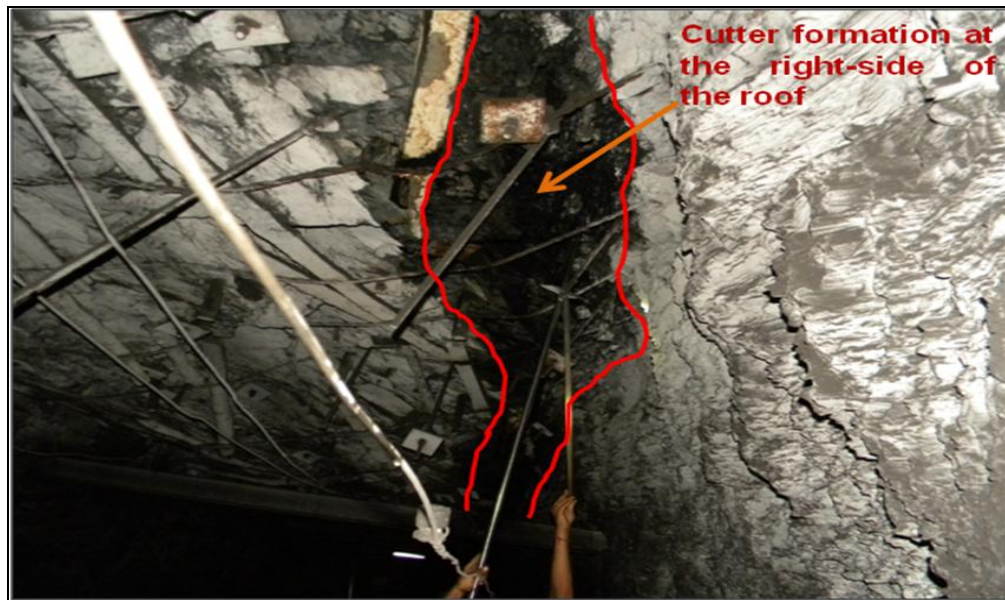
Cutter roof conditions at DRC-6,7,8 Inclines, WCL
